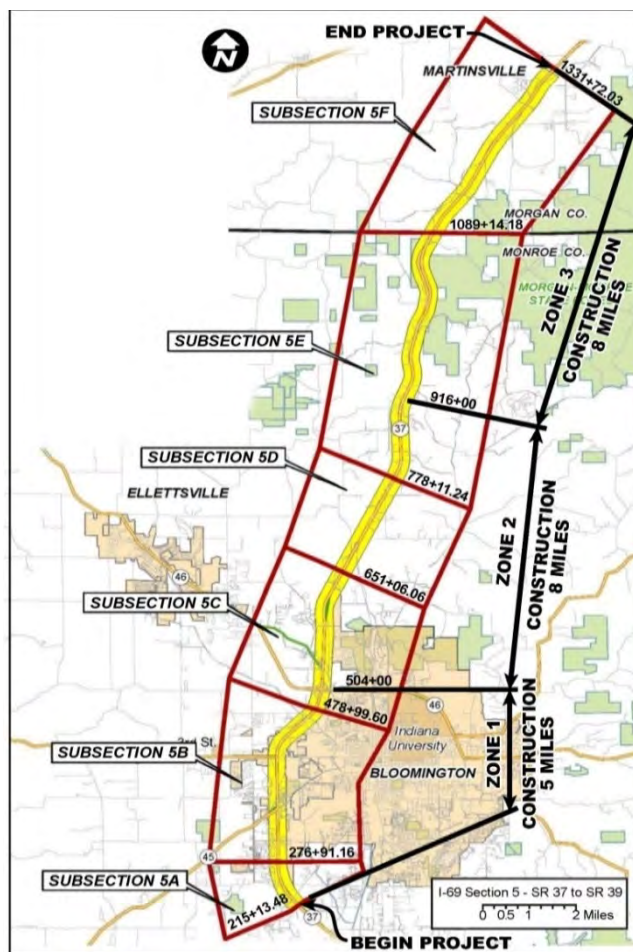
I-69 Section 5 Project Limits and Construction Zones.
